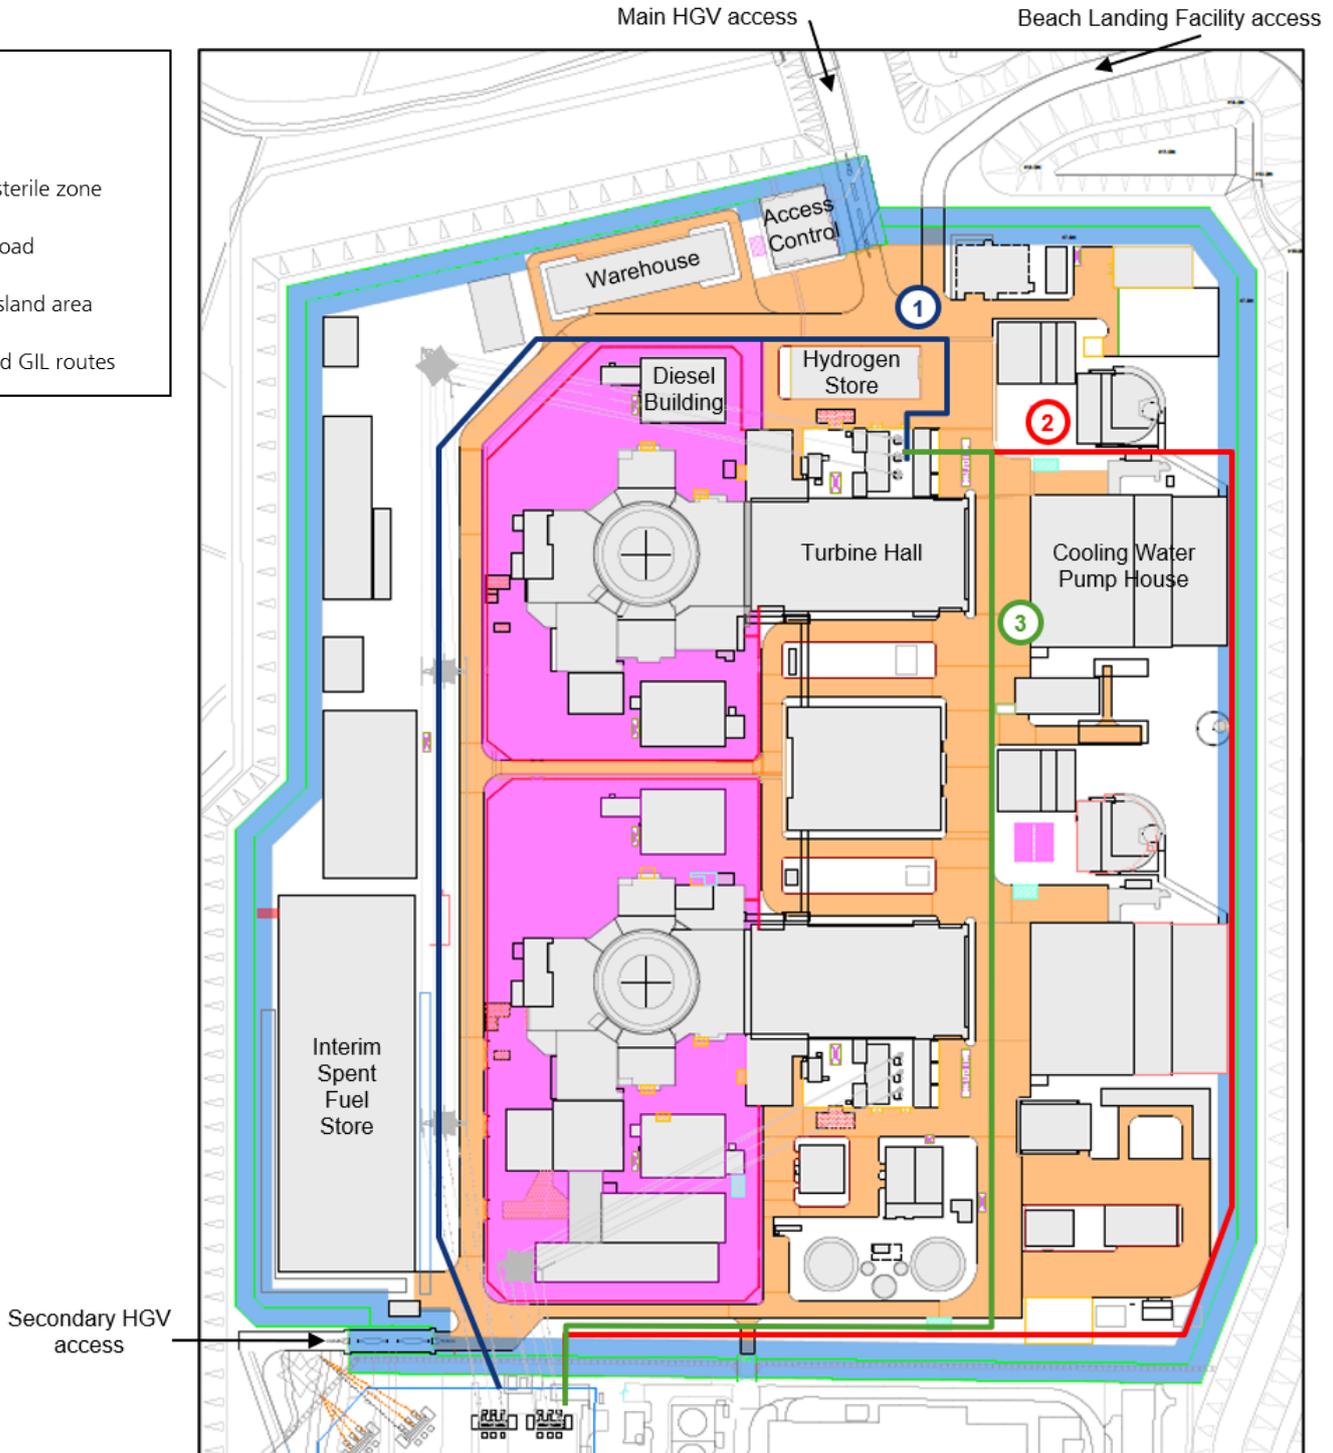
Plan of the proposed SZC site showing postulated routes for GIL connections. Areas where GIL could not be installed (in troughs or above ground) are shaded.
